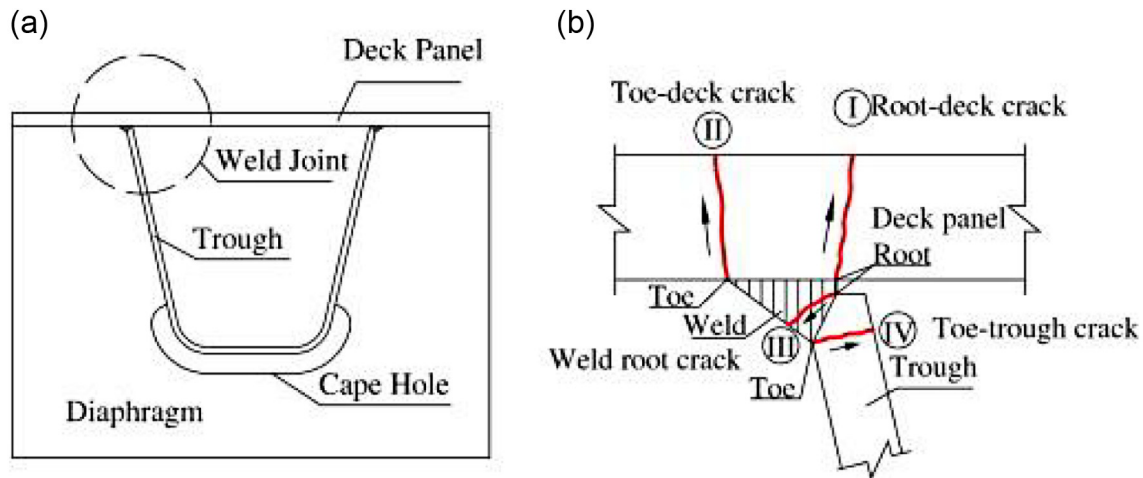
Rib-to-deck joint fatigue cracks [4].
